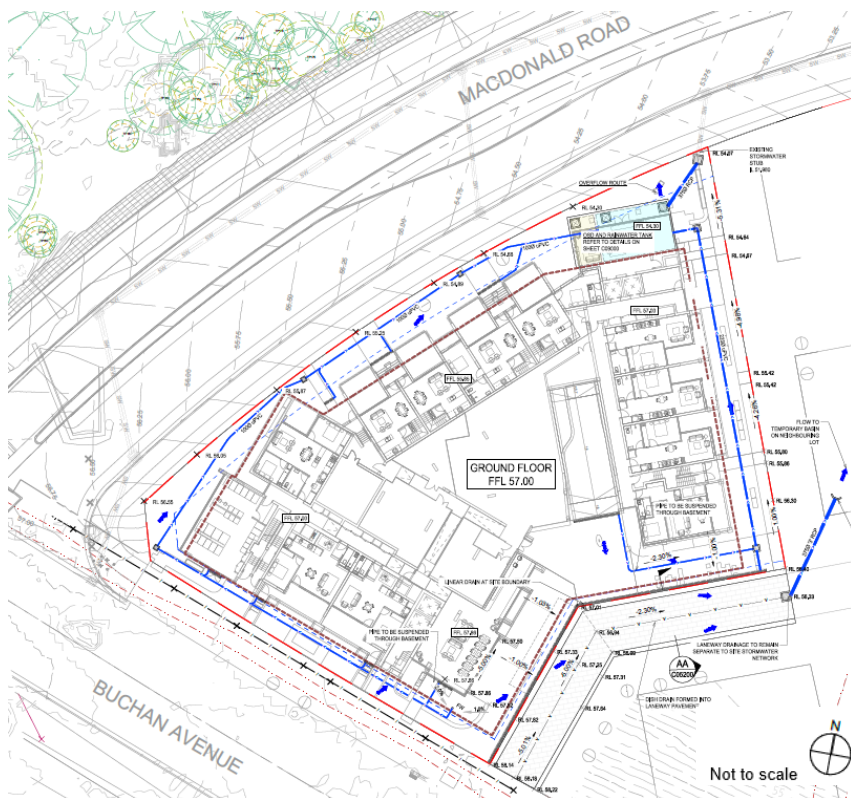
Stormwater management plan at ground floor (source: Xavier Knight, 2026)
